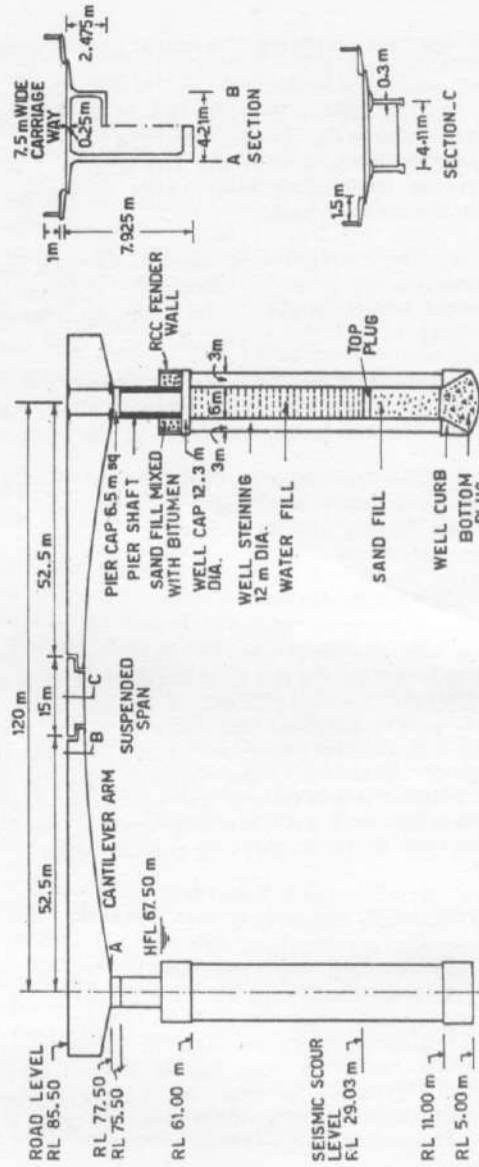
Elevation and Section of Typical Cantilever Span of Kaliabhomora Bridge.
